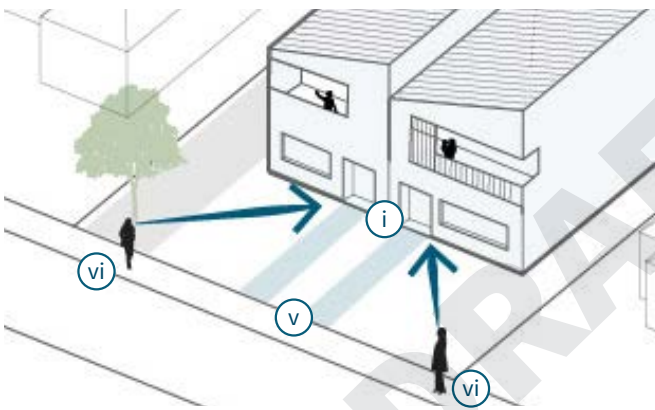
Main doors should be visible from the street, provide direct access from the public realm and contribute to street activation.
